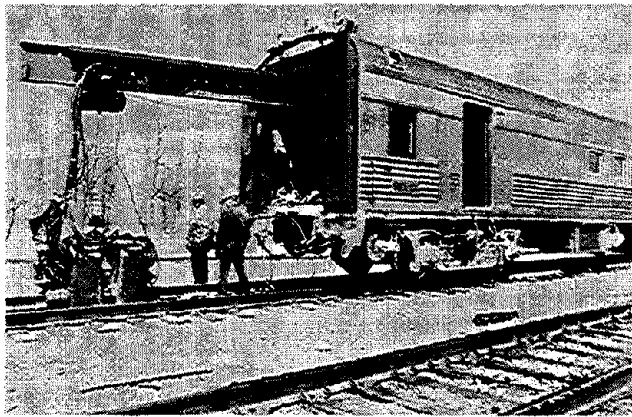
First U.S. in-track welding outfit FWX-101. (Photograph courtesy of AT & SF.)
